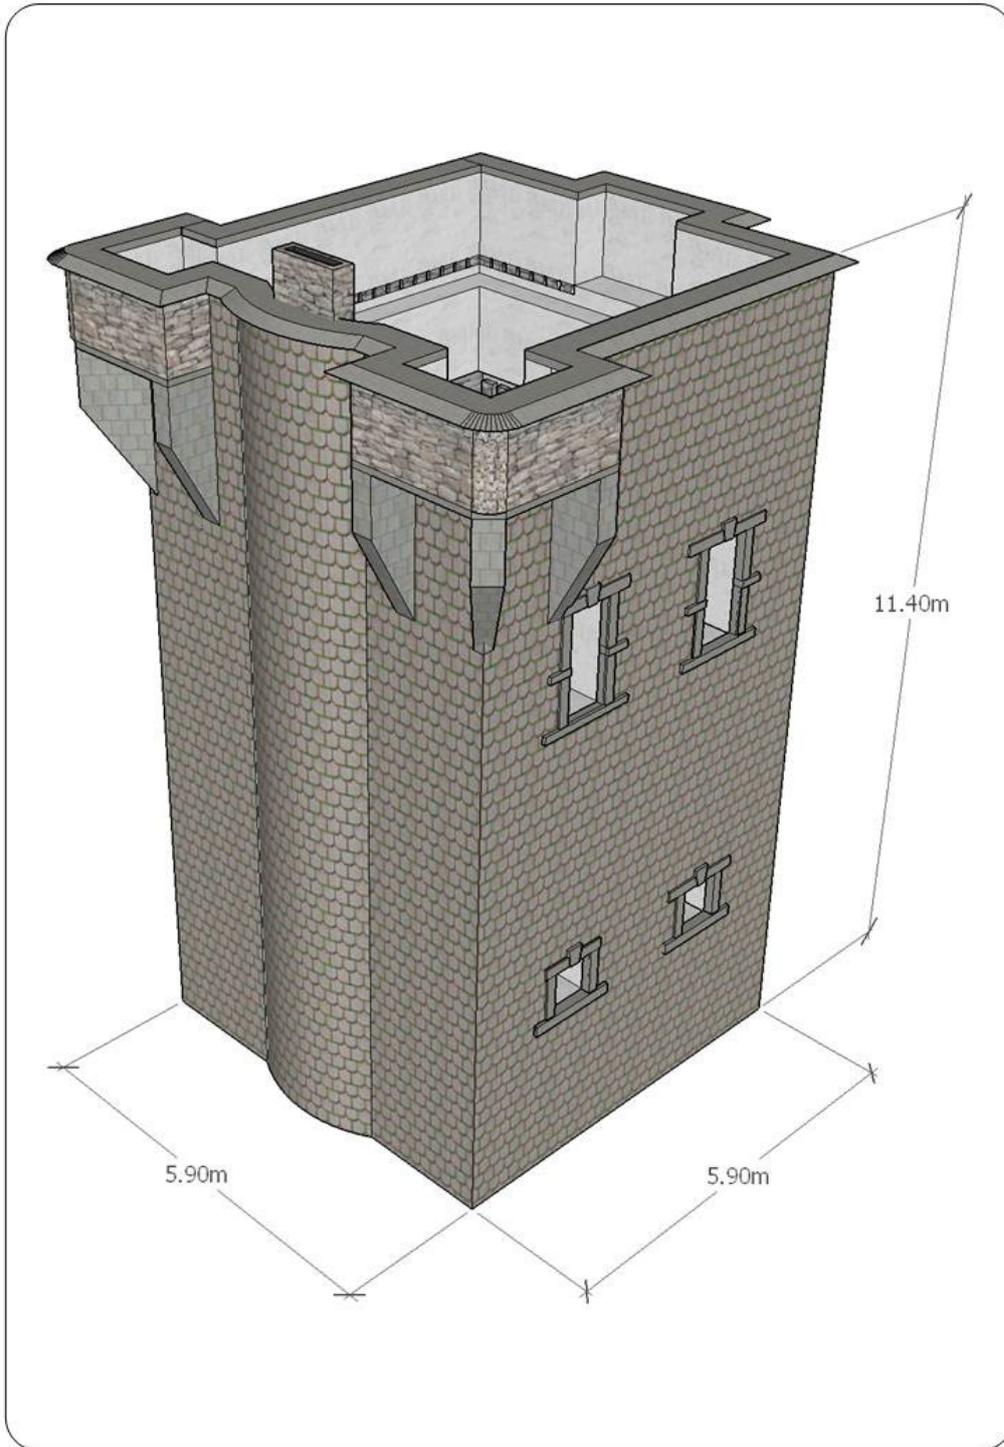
Oblique external view of rendered 3D model for an idealised signal tower showing side wall and rear wall.
